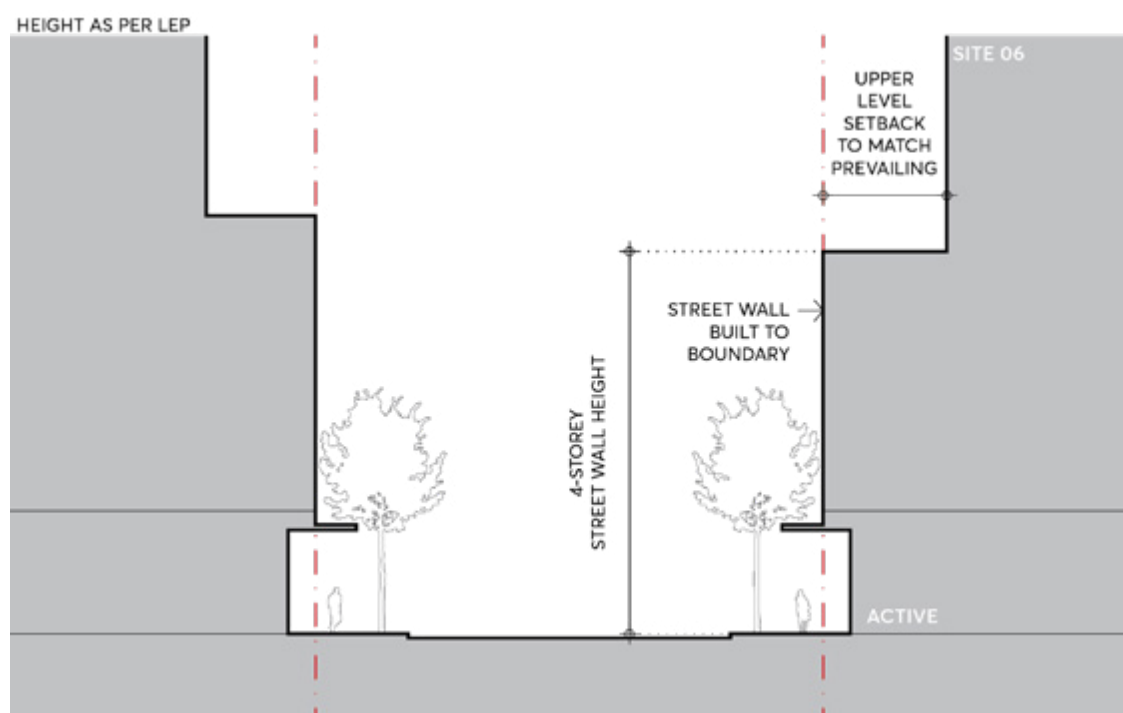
Cowper Street (Section C) Setbacks and Street Wall Height
